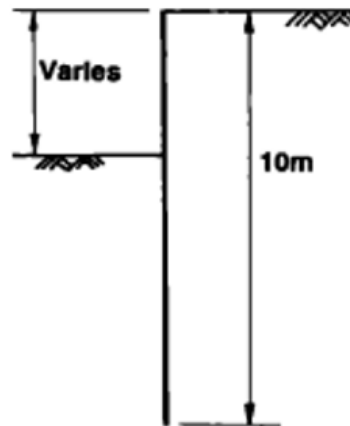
The geometry of the sheet pile retaining wall for numerical modeling (Day and Potts, 1993).
